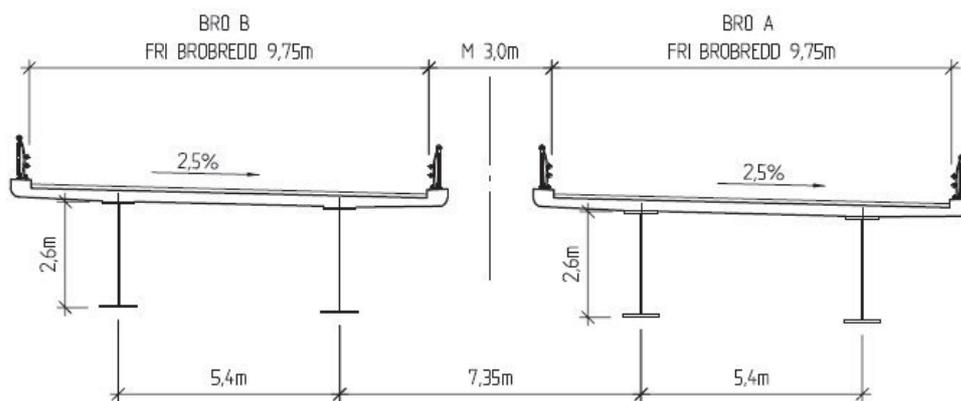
Cross section of the bridge at Rångedala, Sweden.
